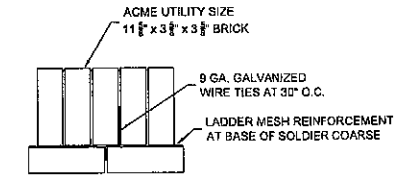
' to 8' CAST IN PLACE PRIVACY WALL
